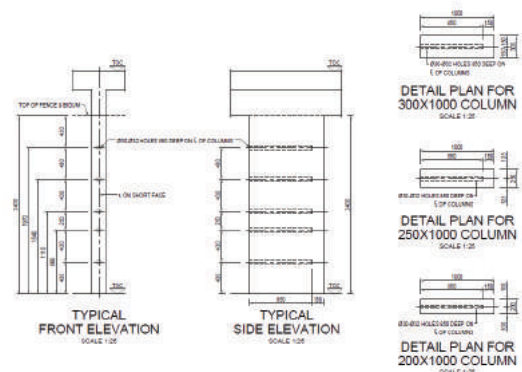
Drilling Details of Ground Floor and First Floor Columns
